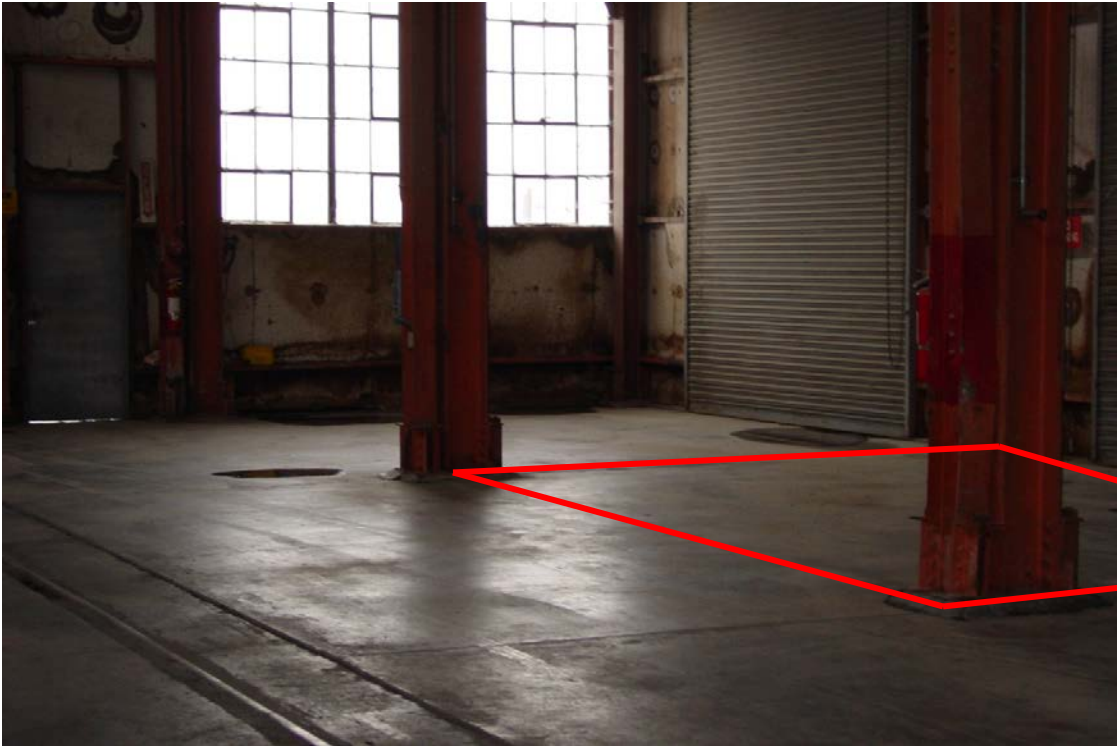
Building 14 Universal Waste SAA, Looking West (March 2011)
